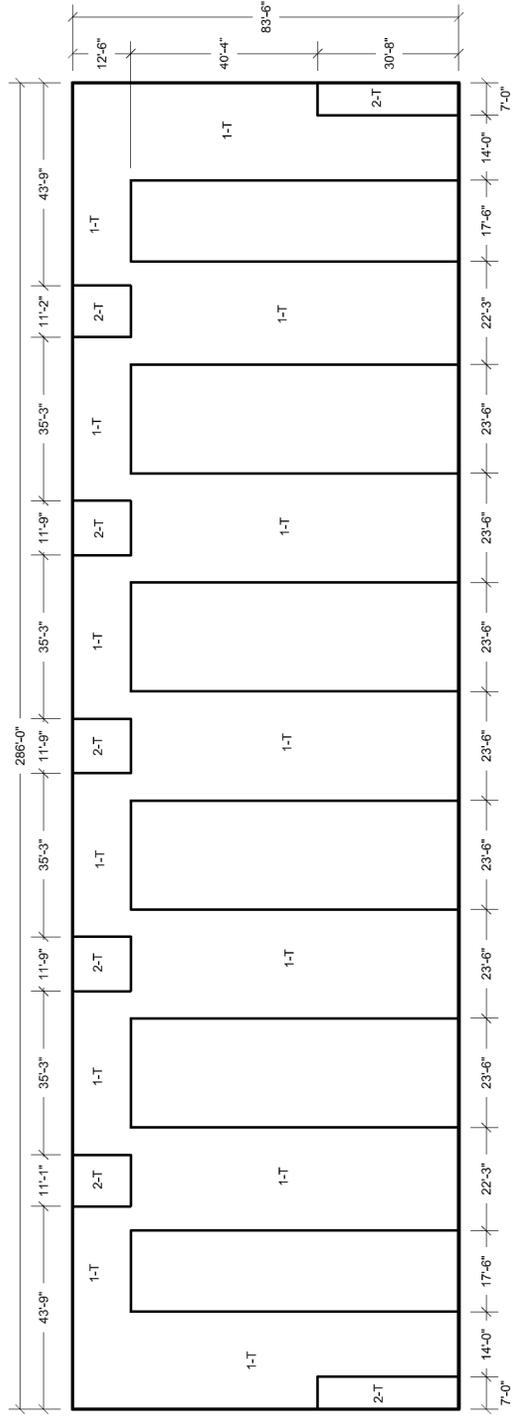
H.6-81: UHS BASIN SOUTH WALL LOOKING NORTH
